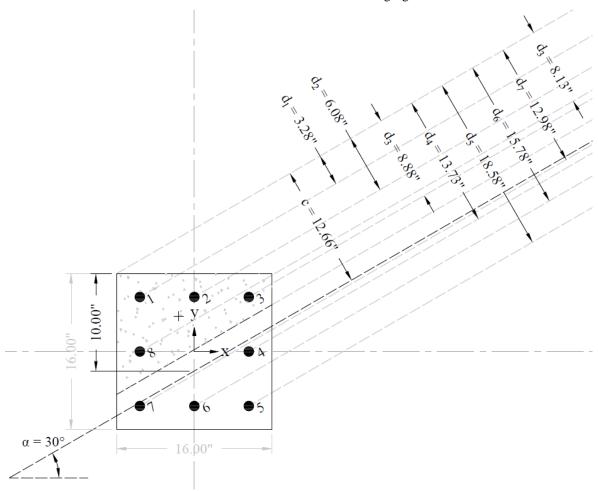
Reinforced Concrete Column Cross-Section and Reinforcement Locations
